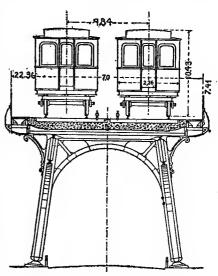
CROSS SECTION OF BERLIN ELEVATED RAILROAD
